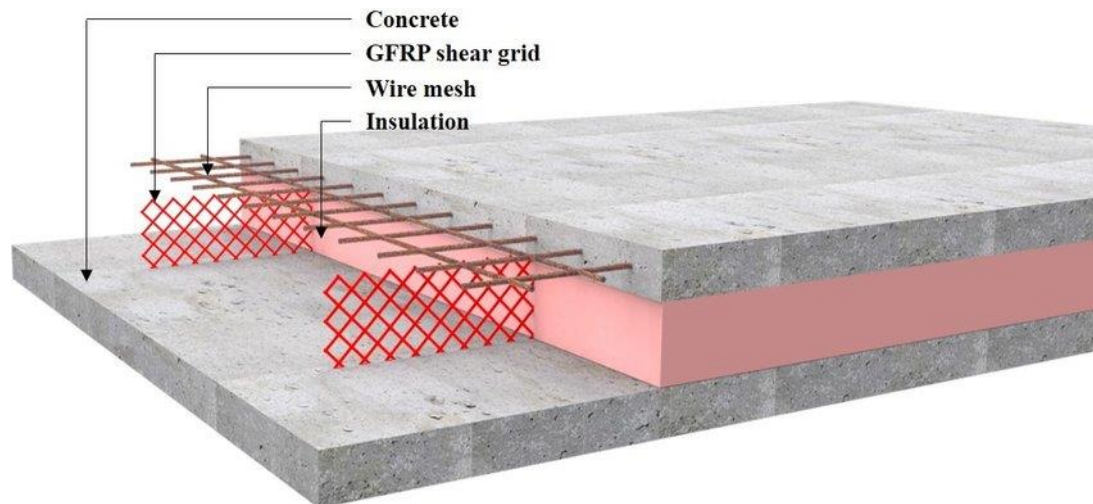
Insulated concrete sandwich wall panel reinforced with glass-fiber-reinforced polymer (GFRP) shear grids. [43]
